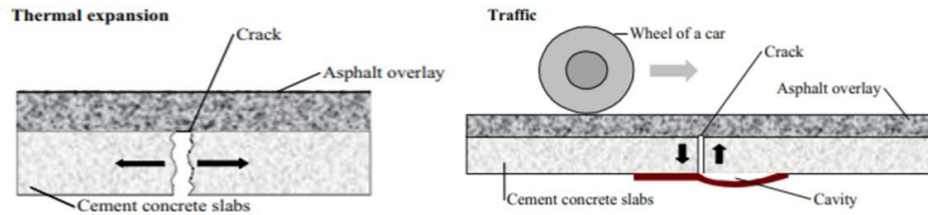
Reflection cracking mechanism in composite pavements [33].
